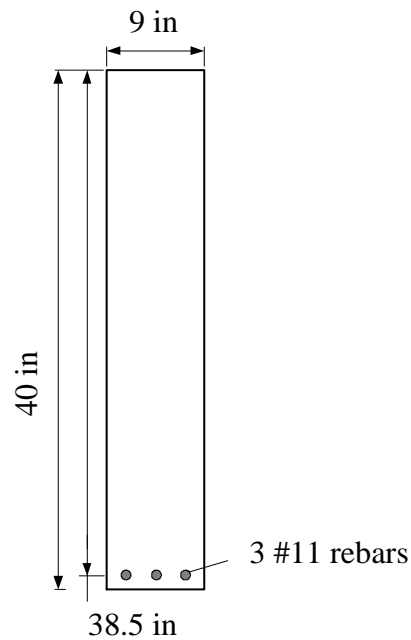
Section dimension and arrangement of longitudinal reinforcement steel rebars for section UHP/St60 40R-4
